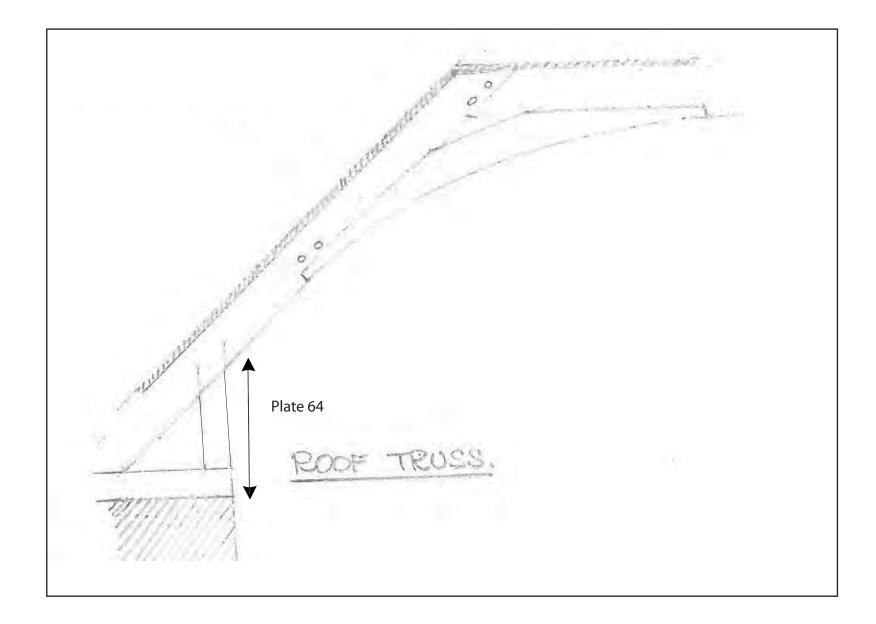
Sketch drawing of the possibly 15th century roof truss in first floor room of the disused chapel made in 1932 (RCAHMW, C42238). The area still visible through later work is indicated.
